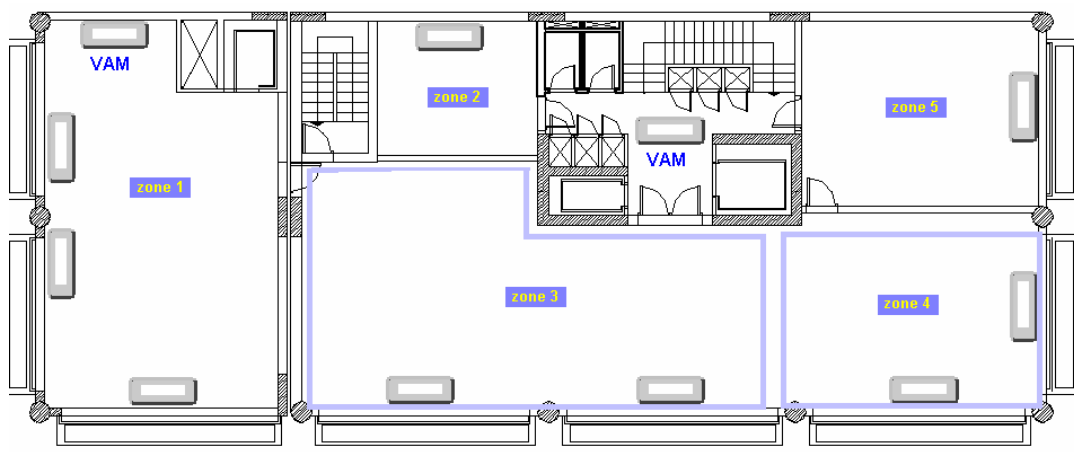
1<sup>st</sup> Floor and thermal zones plan of BYTE
